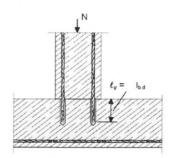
Rebar connection for components stressed primarily in compression. The rebars are stressed in compression
